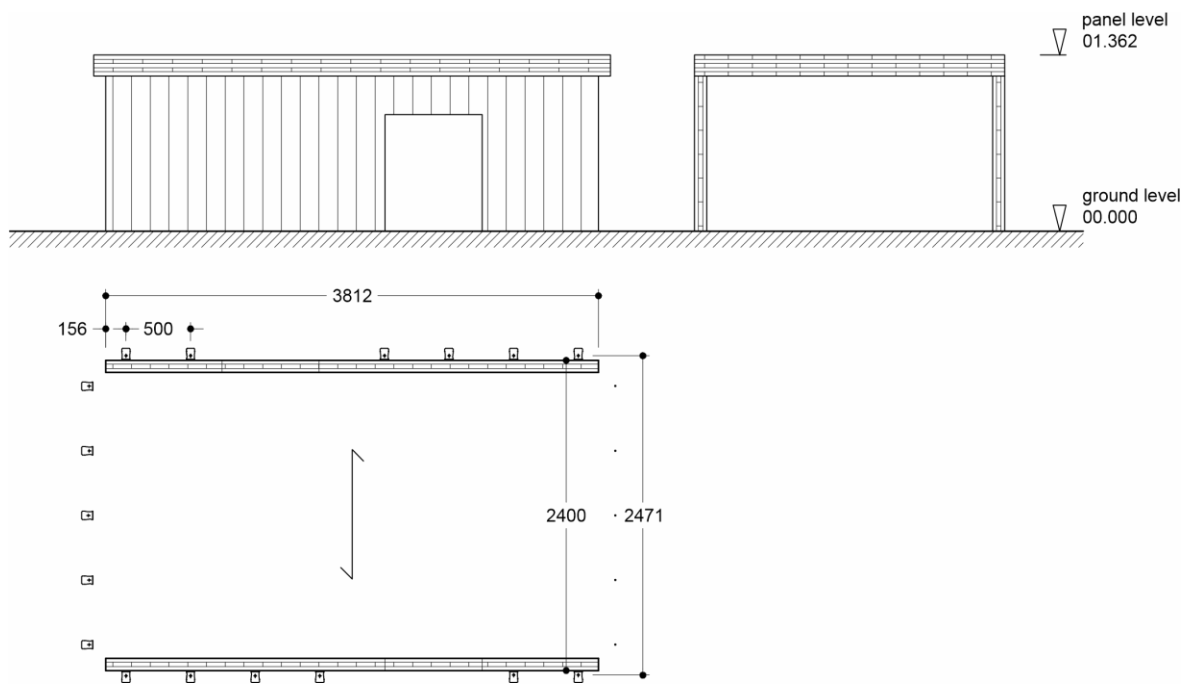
One-way short span platform construction (2212 mm span)
